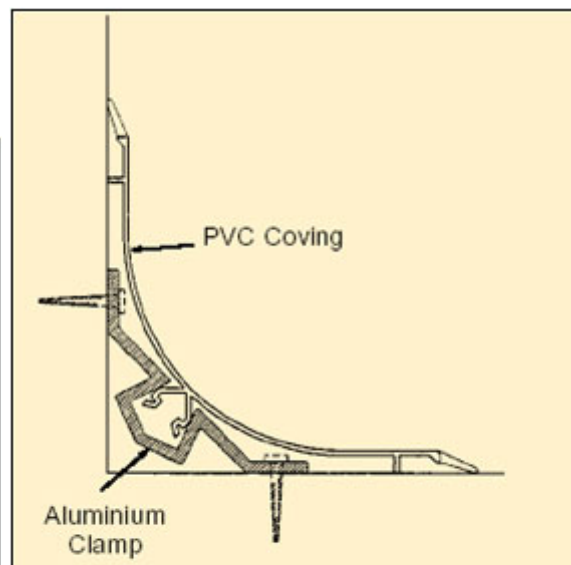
A PVC coving installed in a sharp corner between two walls or wall/ceiling. *Courtesy of Isowall Co., UK
